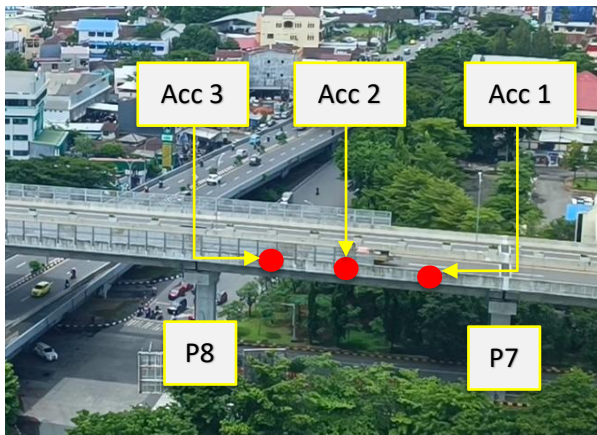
Three accelerometer sensors (Acc 1, Acc 2, and Acc 3) were installed on the bridge span between pier P7 and pier P8.
